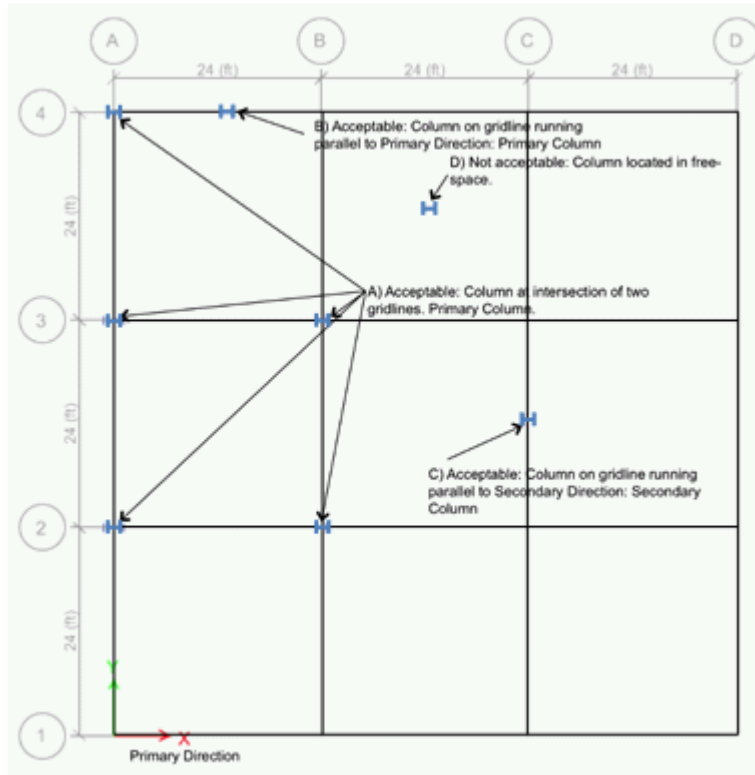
Example of Acceptable and Non-Acceptable Column Placement
